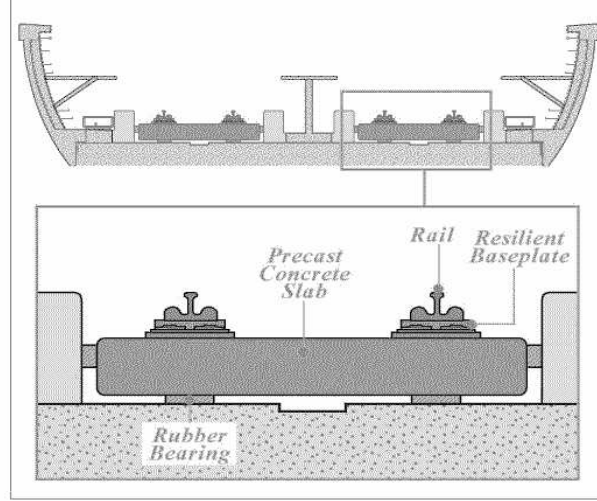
A floating-slab track: the concrete track slab is mounted on rubber bearings.
